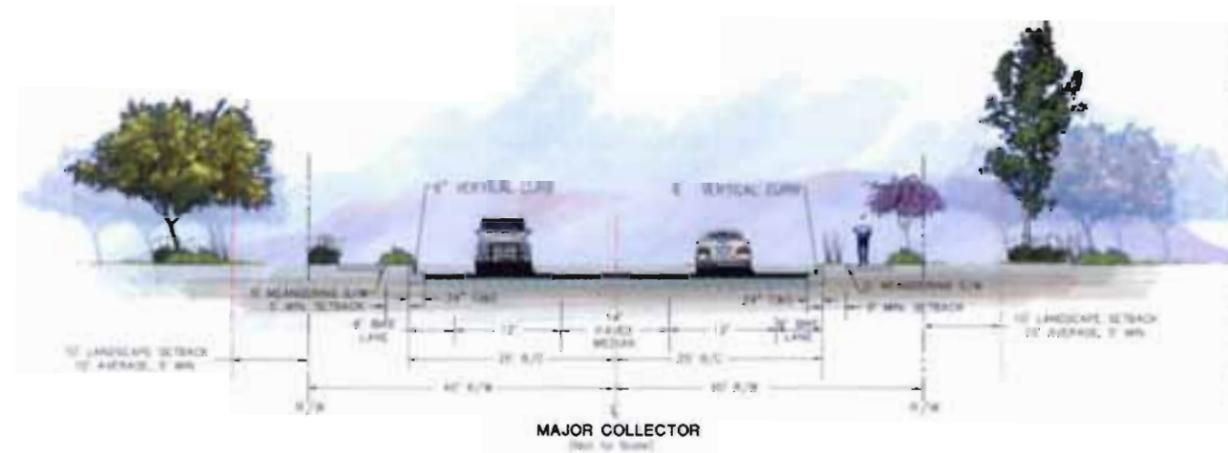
COLLECTOR STREET CROSS-SECTION OPTIONS
